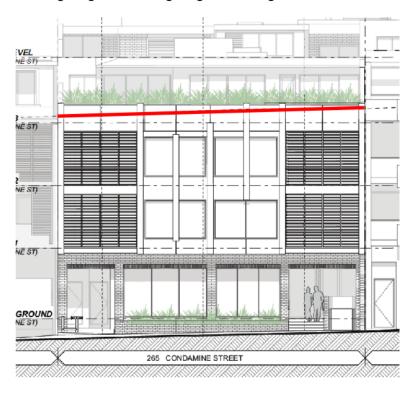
Extent of building height breach adjacent to the Condamine Street frontage
